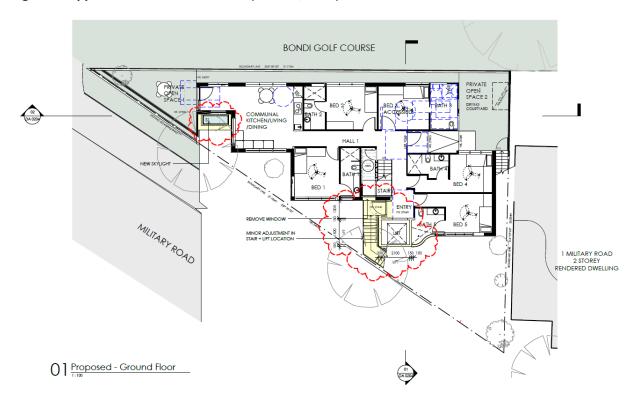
Proposed Ground Floor Level (DA-203/2021/A)
